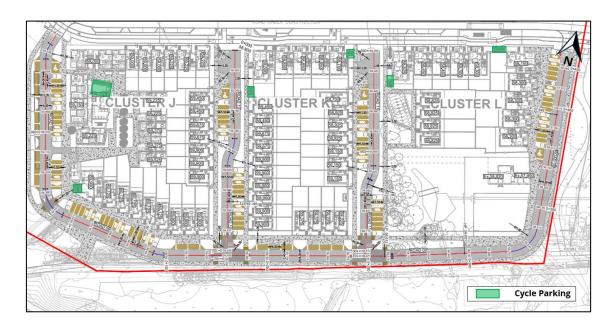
Site 4 Cycle Parking (South of Link Road)
